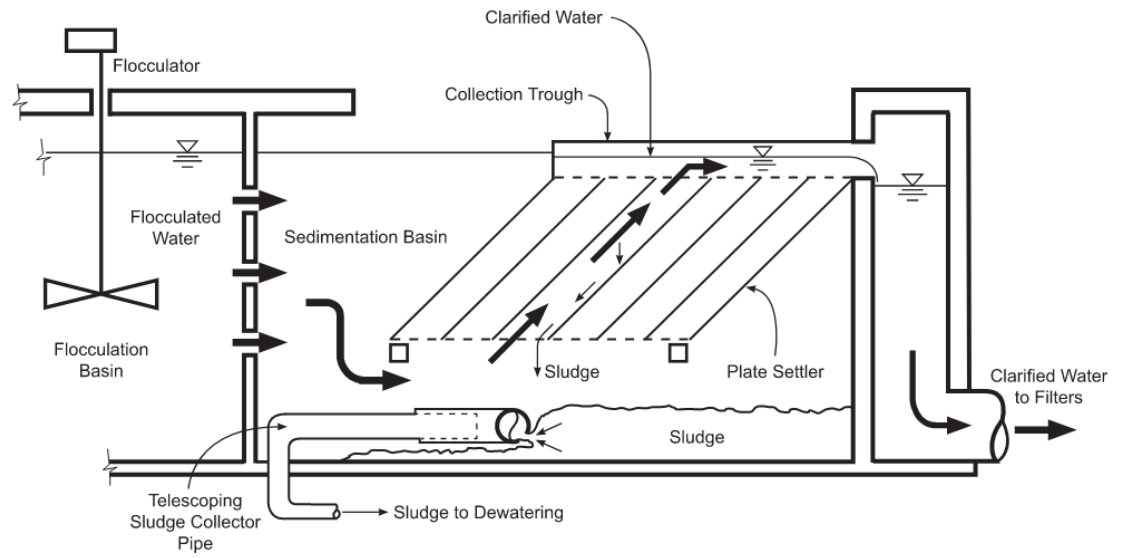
Cross Section of a Typical Plate Settler Installation
